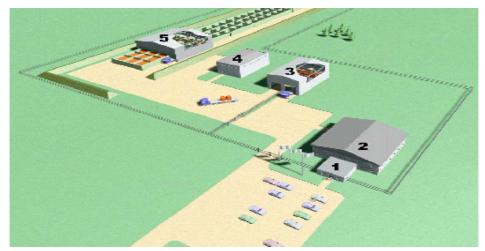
The conceptual design of the proposed near-surface repository (to be adjusted to the specific layout of the site in the detail design stage): 1 - the entrance and the security check; 2 - the administration, the central control room and the laboratory; 3 - the interim storage facility for radioactive waste packages; 4 - the facility for service systems and equipment; 5 - vaults for the final disposal of
